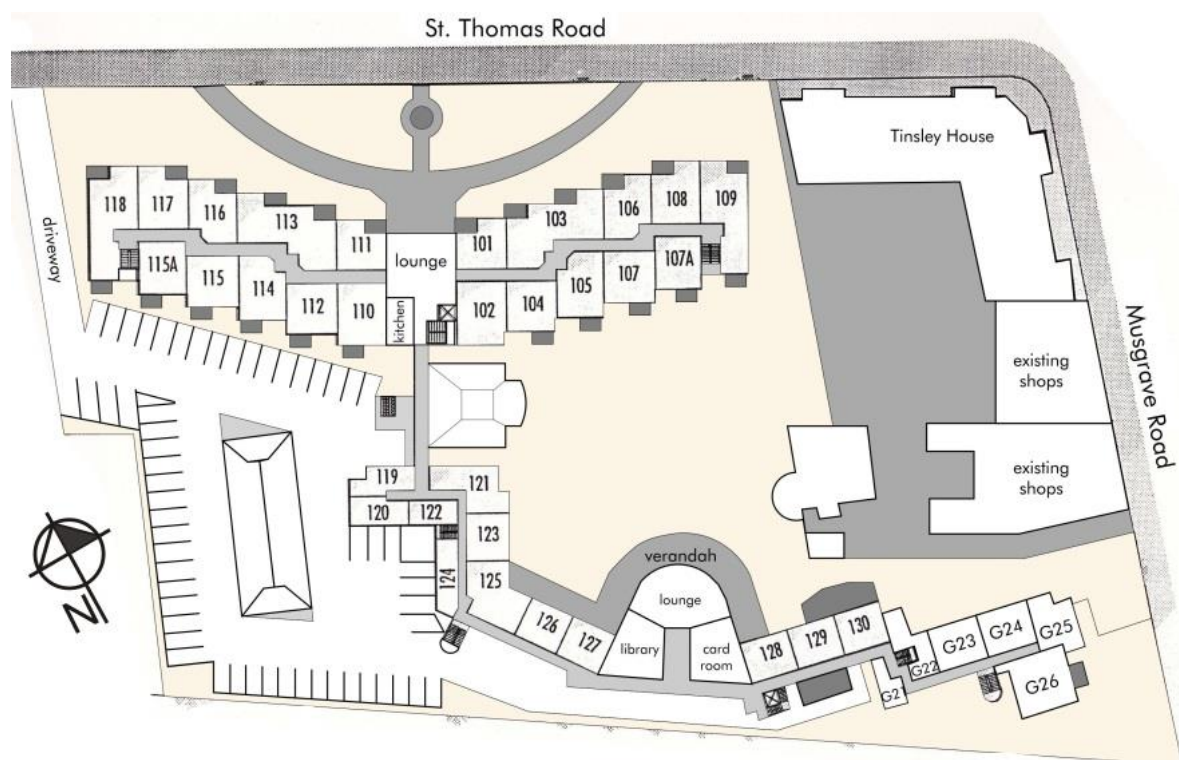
First Floor Plan. (Adapted from (Adapted from Seitter Boyd, 1991: 5)
